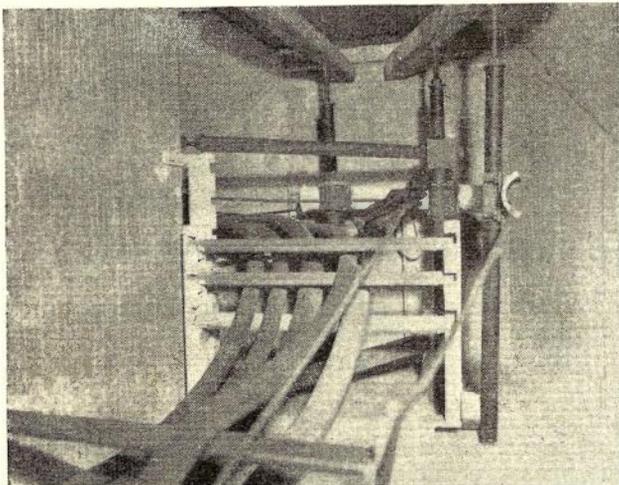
General view of entrance to cable well, showing cable guides in position.
